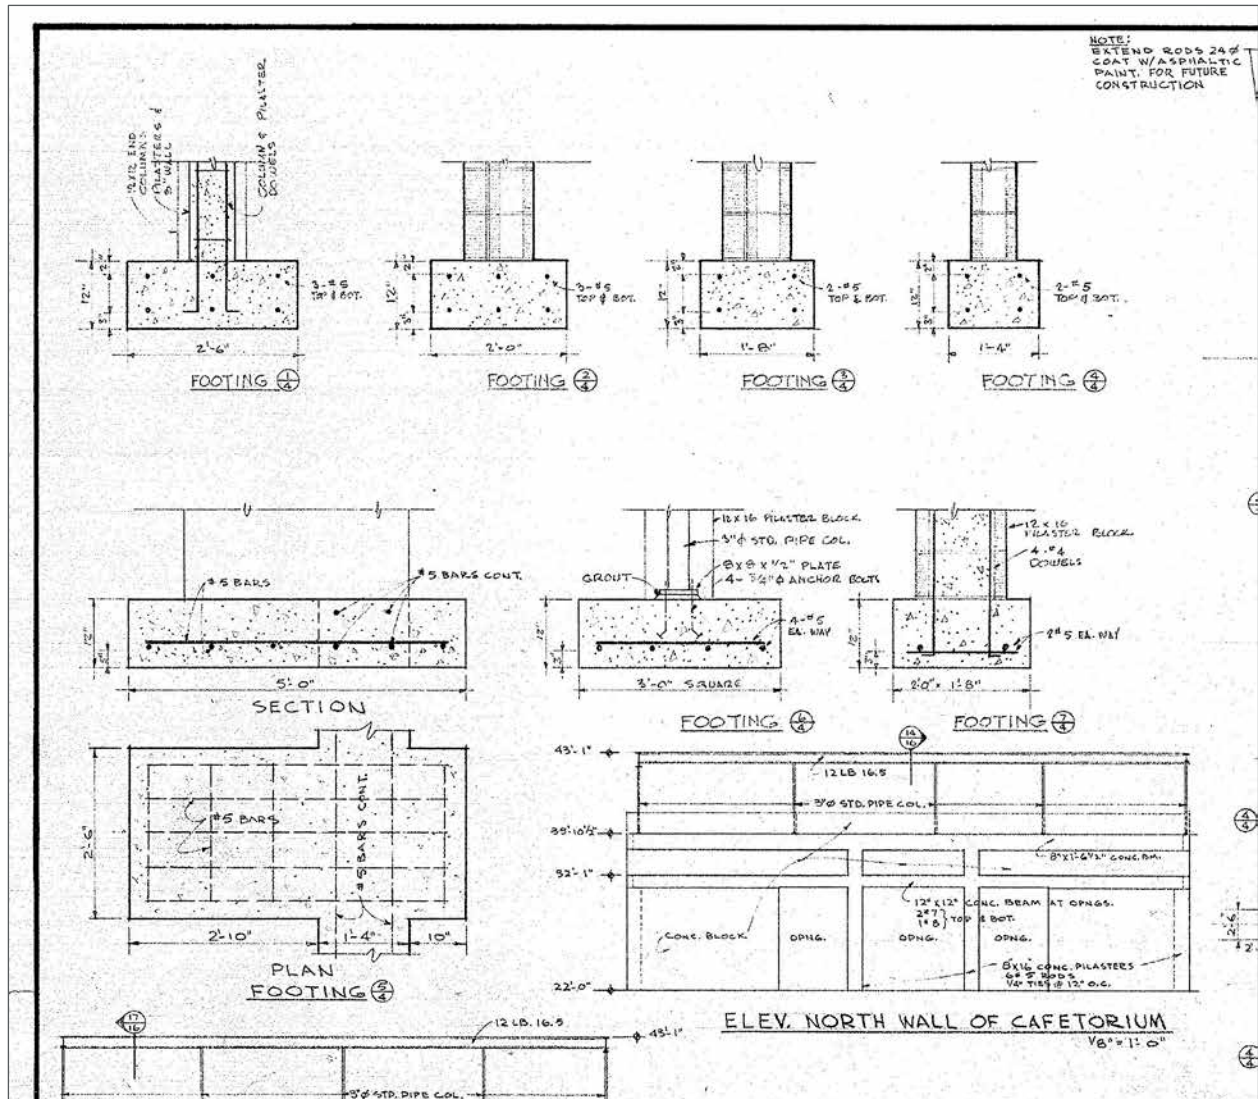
Detail of 1961 architectural plans page A4, showing footing dimensions
